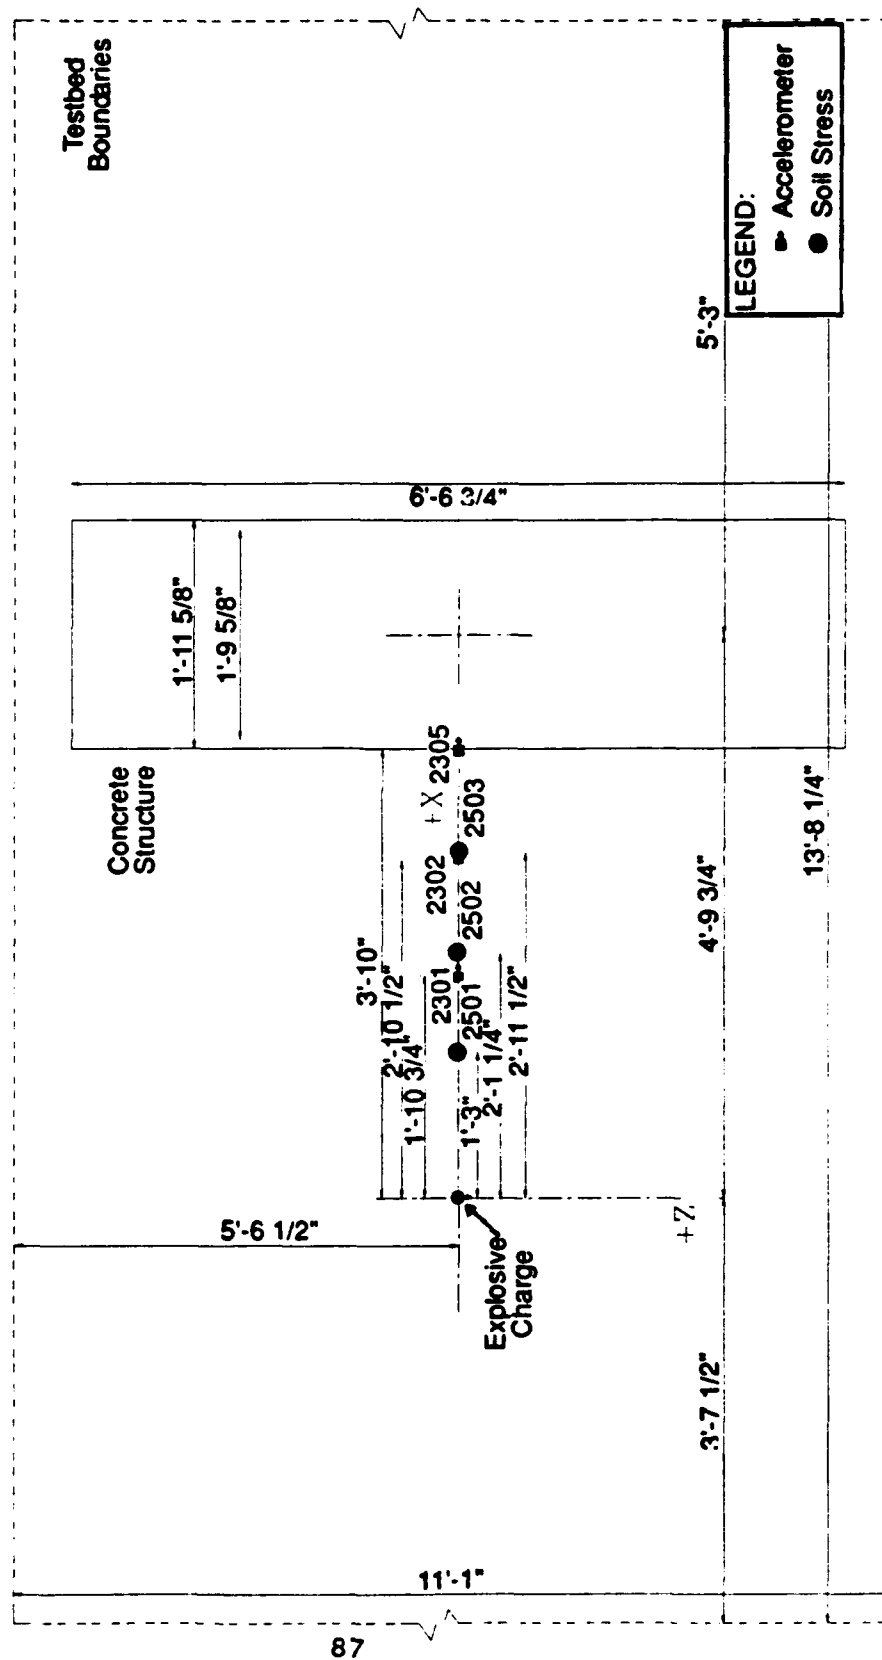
1/5th Froude-Scale Test bed (Plan View).
